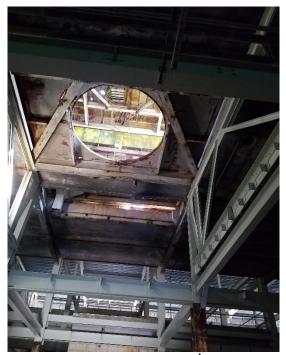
Looking up at Penthouse from 3<sup>rd</sup> Floor (northwest corner)
